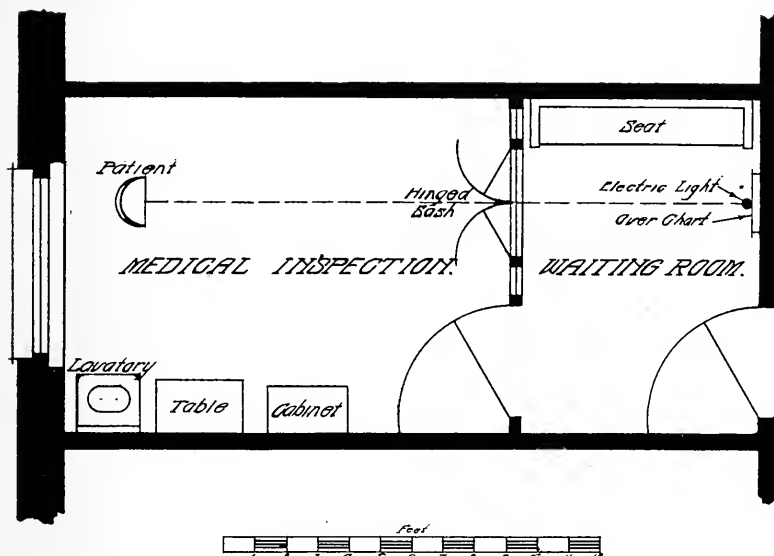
Floor plan and arrangement of medical inspector's room generally followed in New York City. By the arrangements indicated, the width of the waiting room may be used in eye examinations and a space 12 by 20 feet is sufficient for both waiting room and examining room. (After Berkowitz.)
